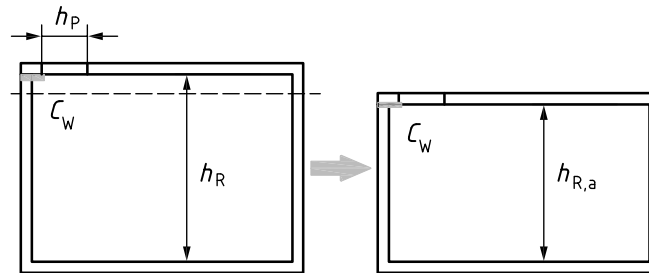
Proceeding of geometric adaption for sloped roof windows to vertical facade window (procedure A)
